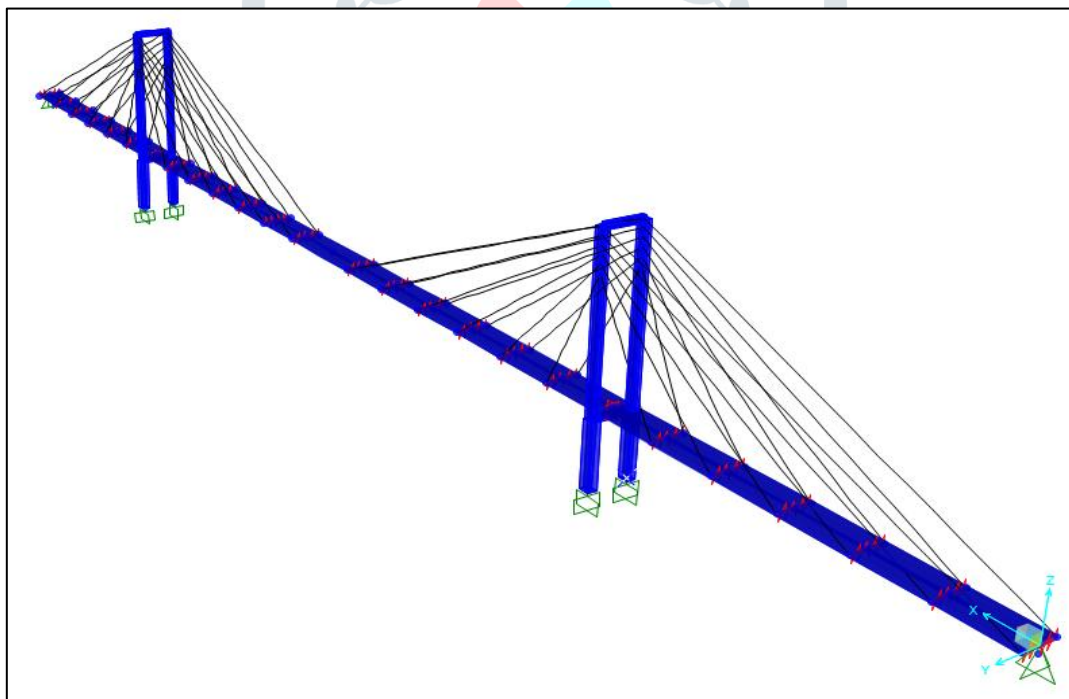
3D Model of the Cable-stayed Bridge (CSI Bridge)
